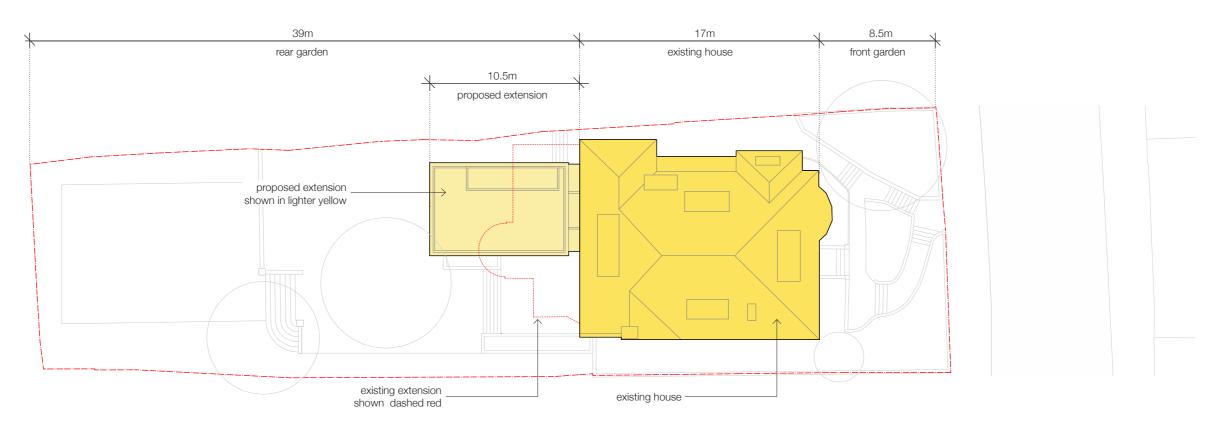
Proposed site plan showing host building and proposed extension in relation to site and existing extensions.
